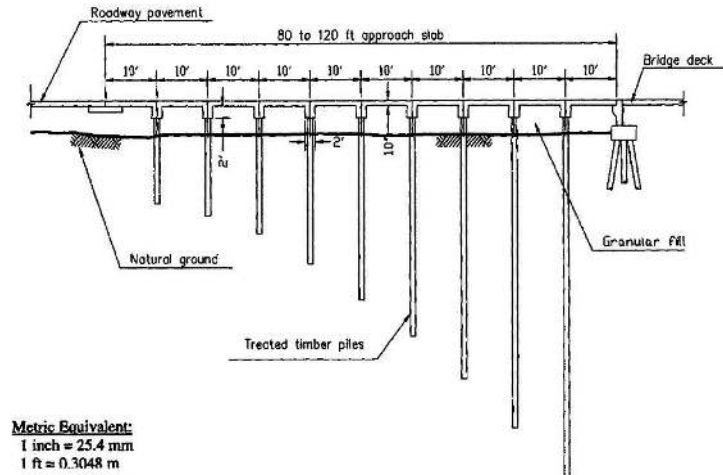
Pile-supported approach slab (Bakeer, Shutt, et al. 2005)
